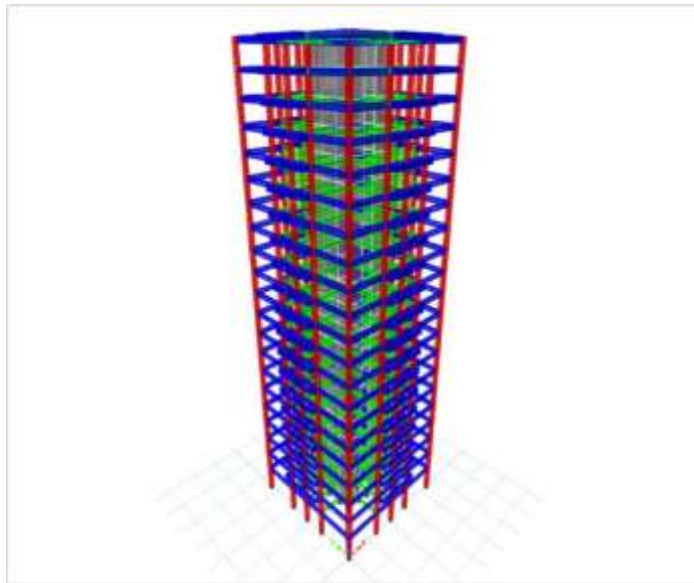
3D view of internal steel beam-concrete column hybrid structure
